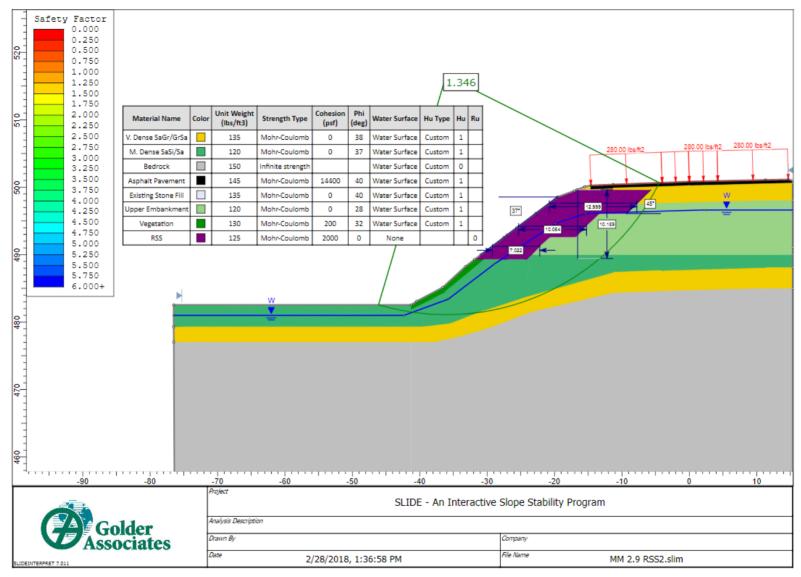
MM 2.9 Alternative C Stability: Reinforced Soil Slope
